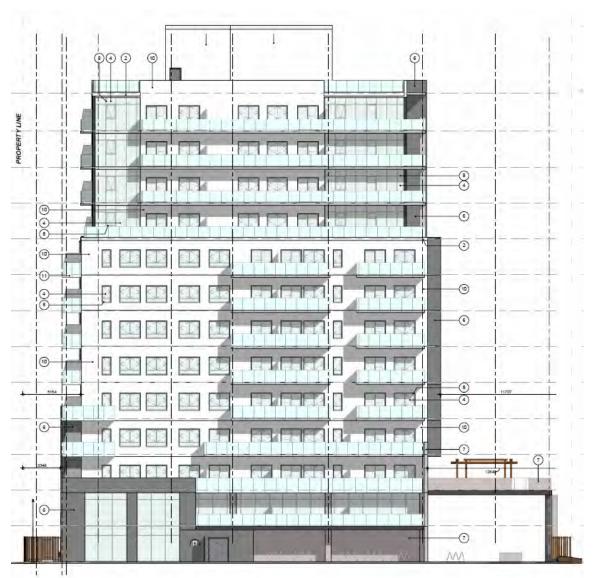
Proposed North Elevation Plan prepared by SRM Architects Inc.
